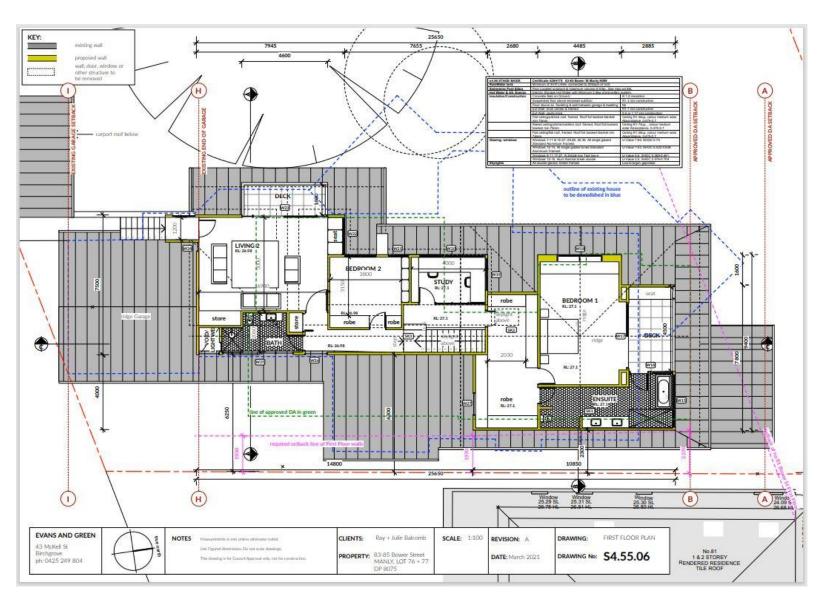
C - First floor plan of proposed amended dwelling house (for detail see final revised architectural plans from Evans & Green 2021)
